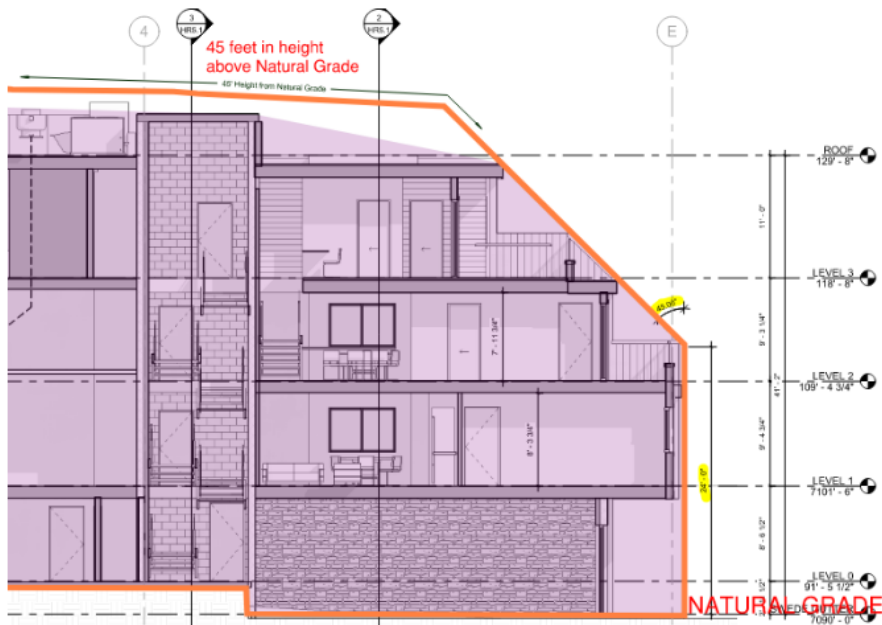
Excerpt from Applicant's plans with staff's markup showing the maximum Building volume outlined in orange and the proposed rear addition building volume.
